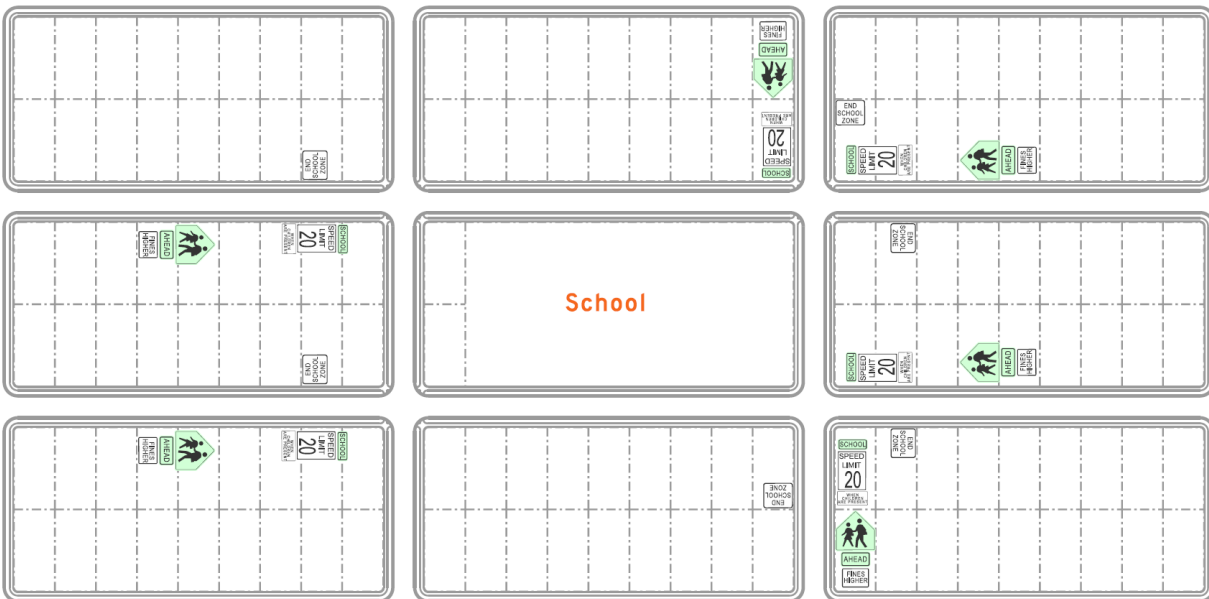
A typical layout of school zone signage for a school located in a grid system layout.
